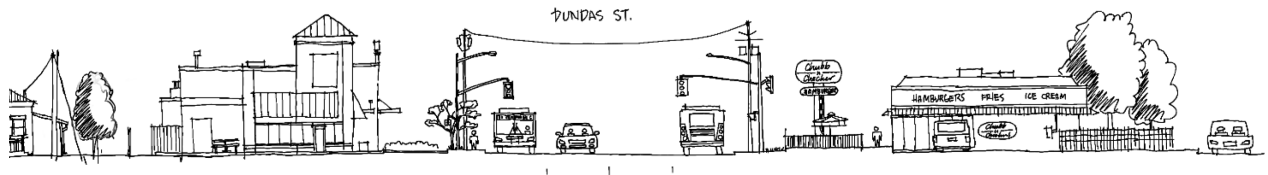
Orthographic section drawing of Dundas Street, Cambridge, Ontario. (Source: By Author)
